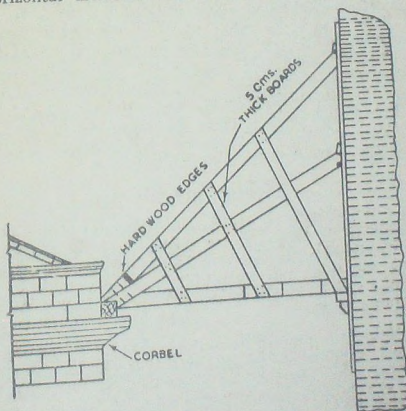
Flying shoring of a building wall from an adjacent old building corbel.
